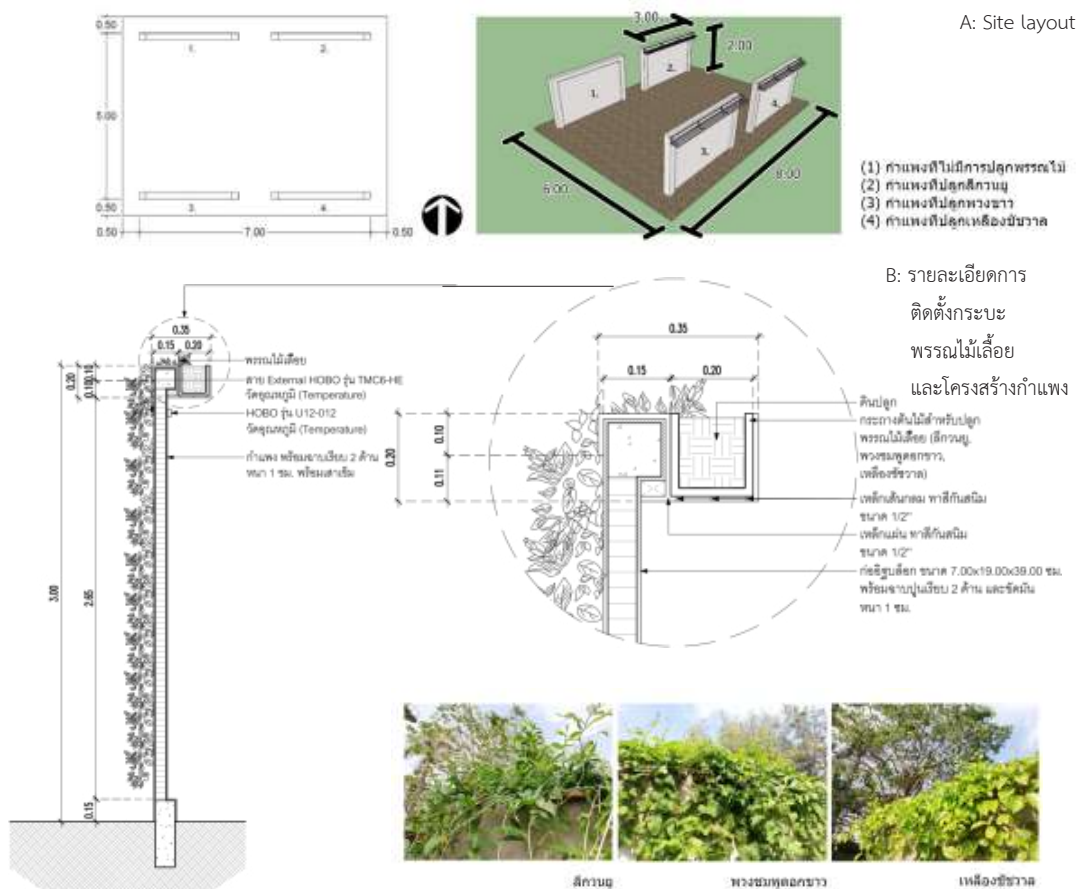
Site layout (A), Installation details of climbing plant boxes and wall structures (B)
